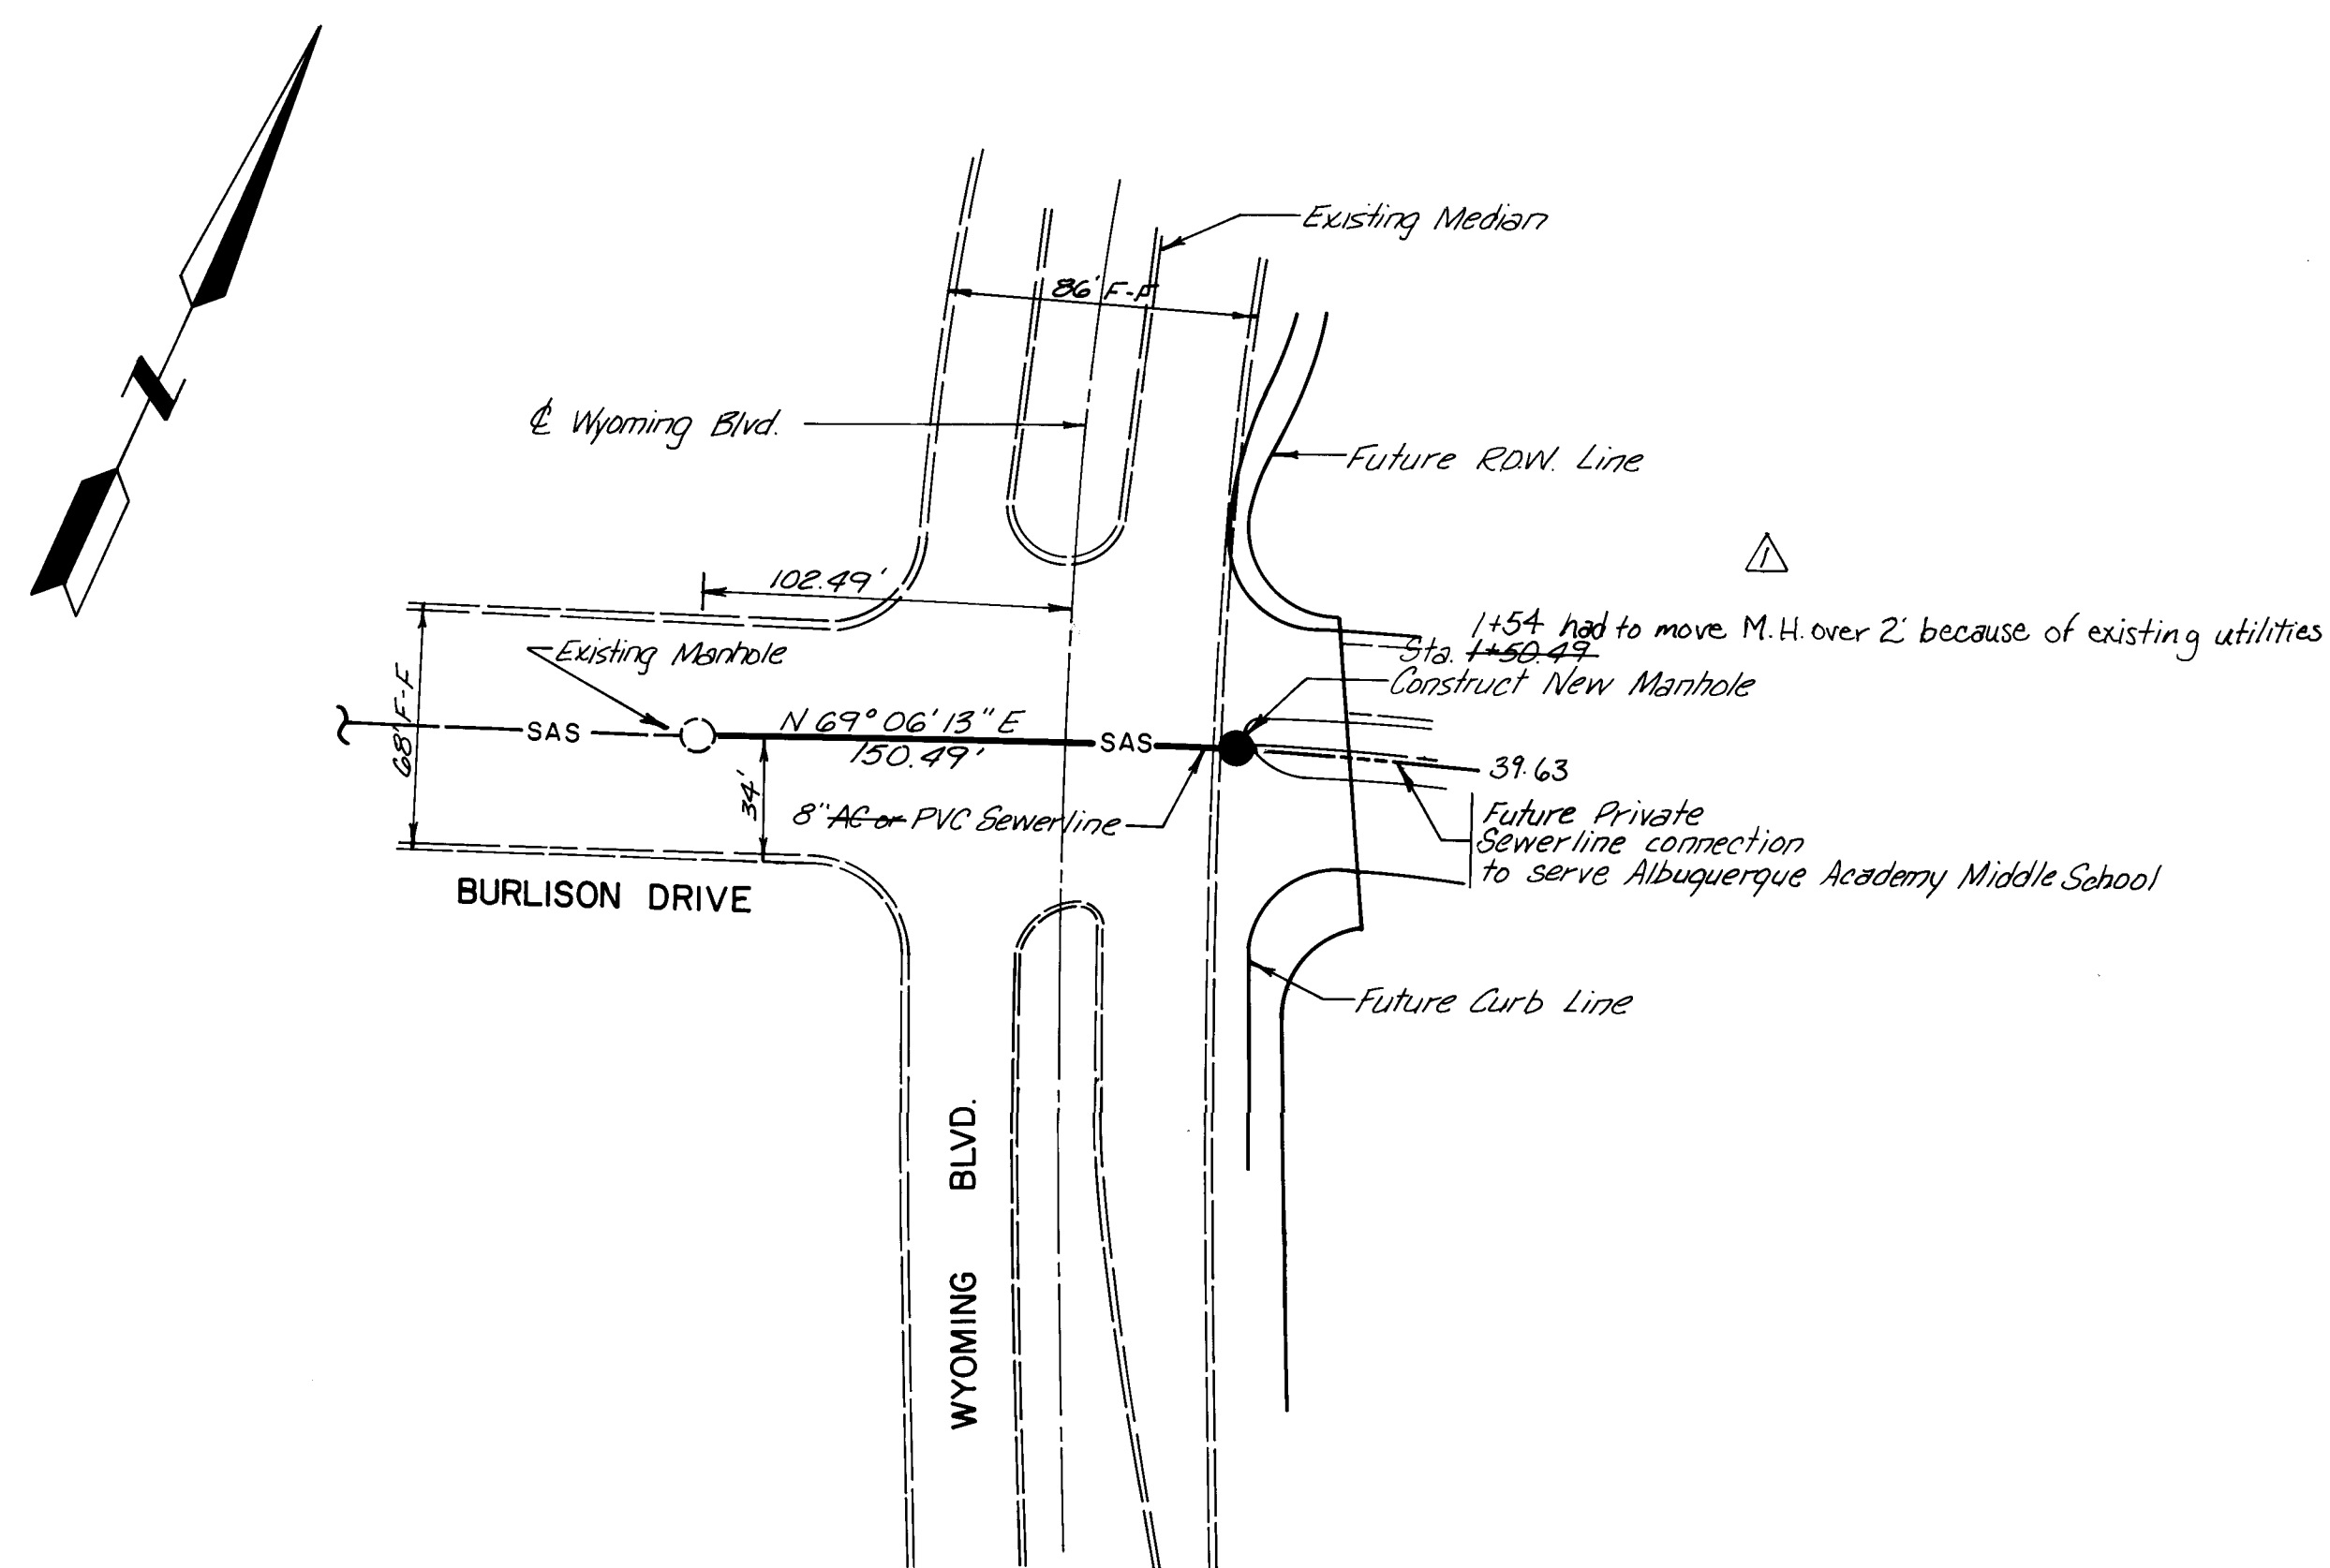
SINGLE PLAN - PROFILE - DOTTED
